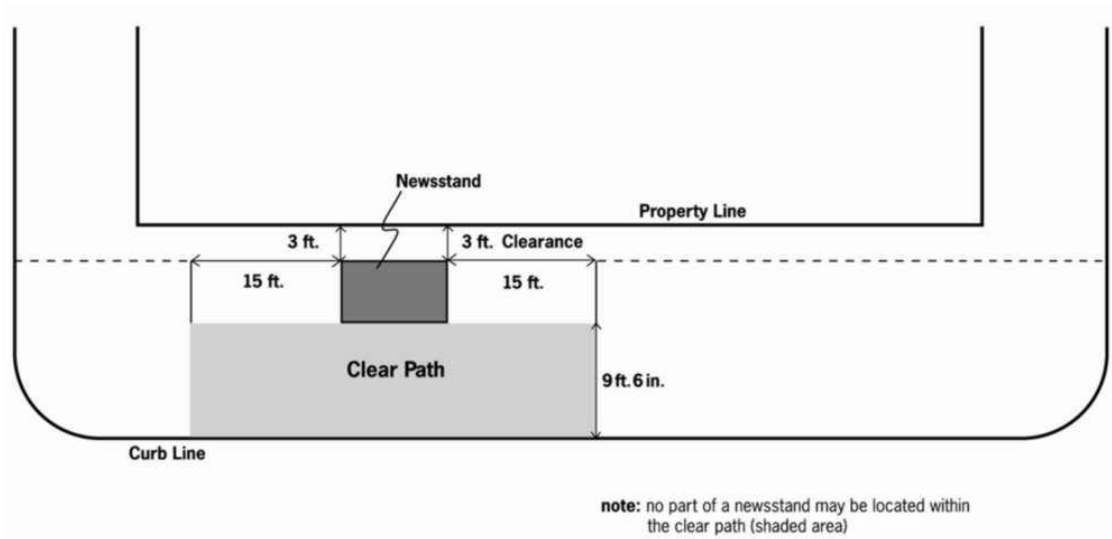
Typical full block front plan showing clearance from corners and curb of streets.
